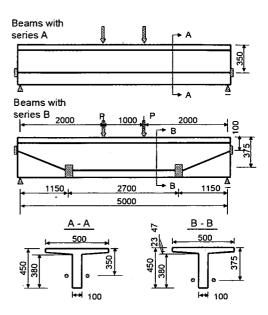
Layout scheme of beams with external cables (Test by Zhang, Z., et al.)
